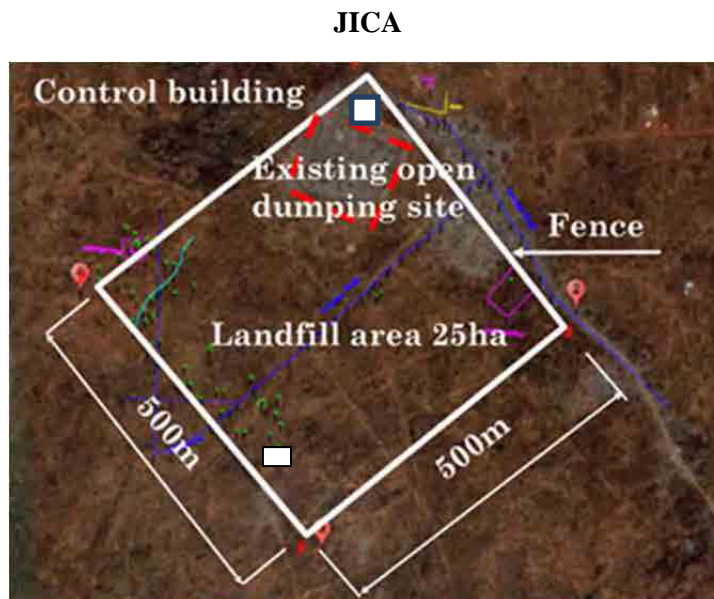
Layout Plan of Control Facility Input from the JICA Side
